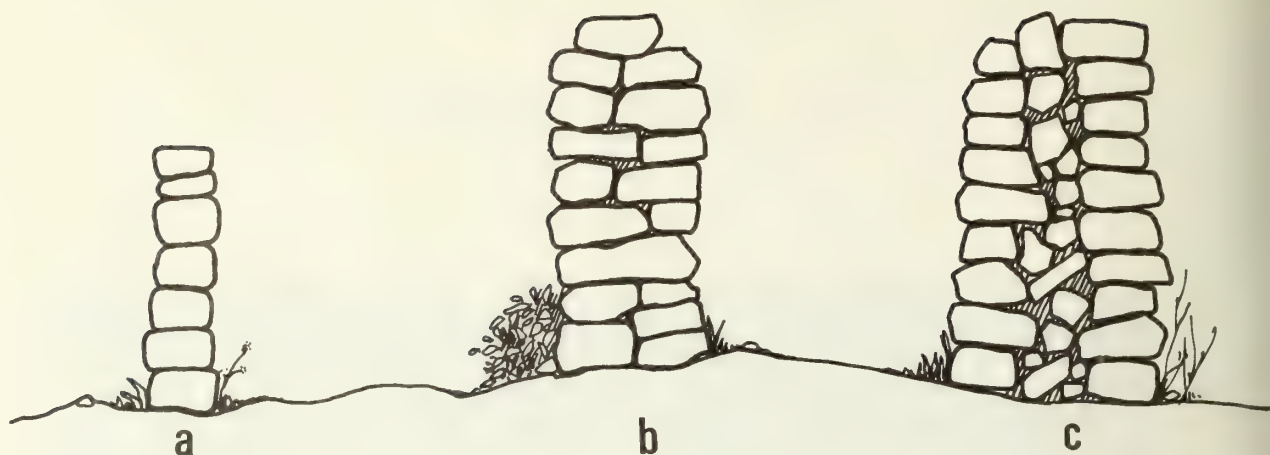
Wall Types. a, single wall; b, compound wall with no core; c, compound wall with rubble and mortar core.
